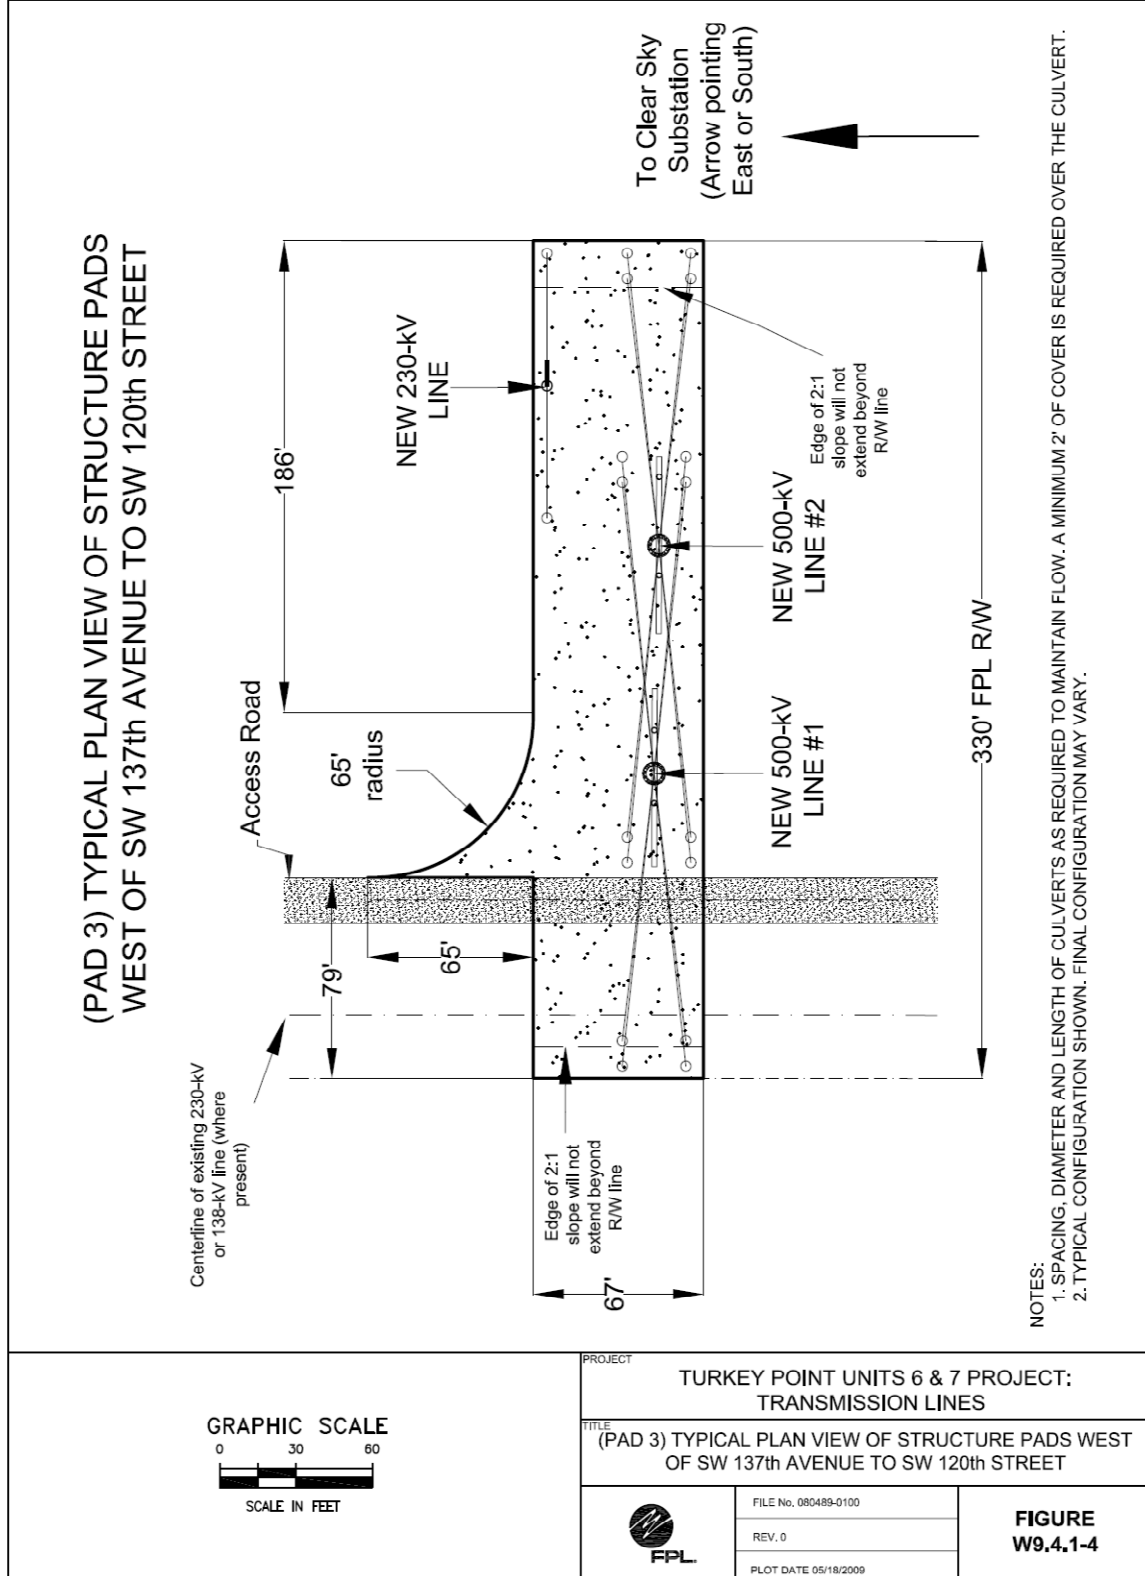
(PAD 3) TYPICAL PLAN VIEW OF STRUCTURE PADS WEST OF SW 137TH AVENUE TO SW 120TH STREET
